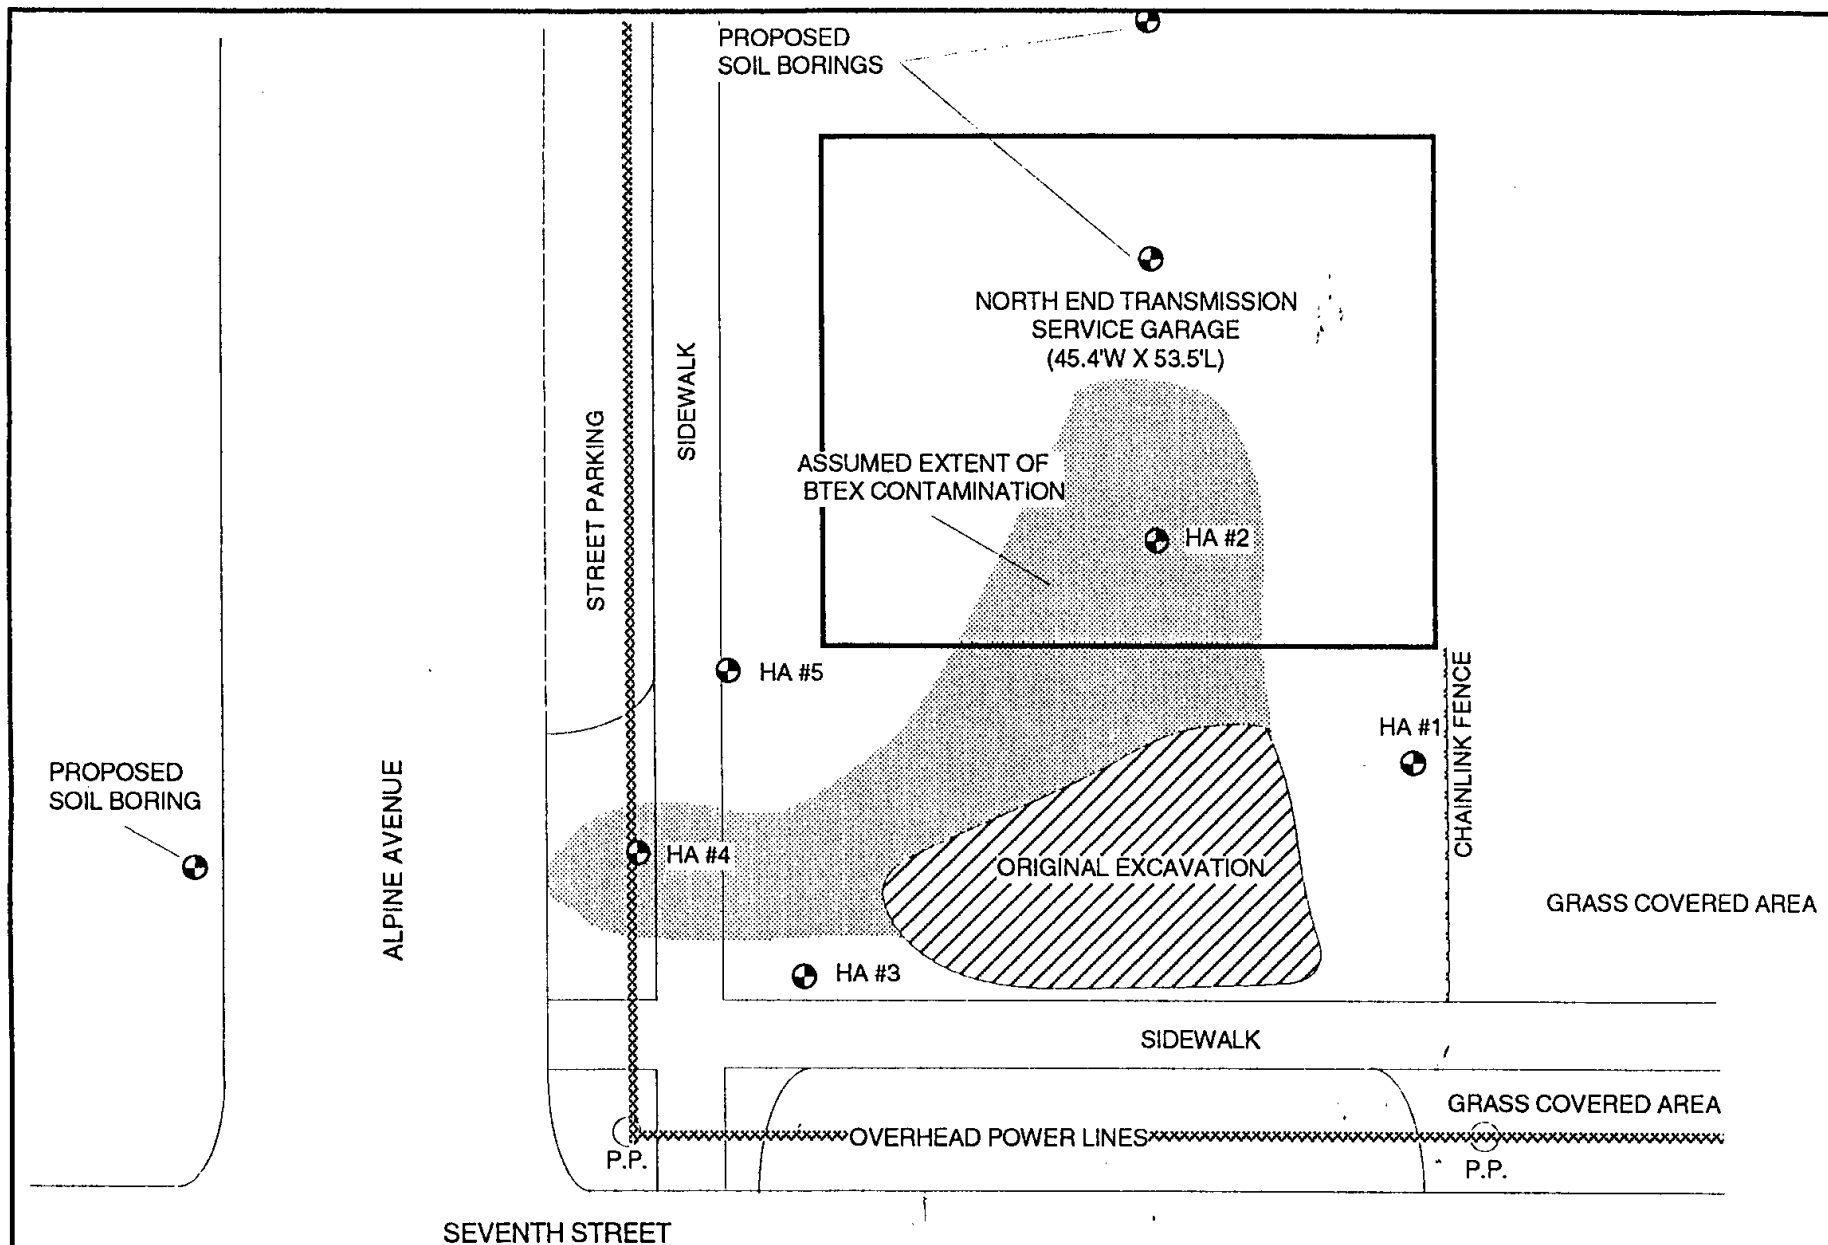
PROPOSED SOIL BORING LOCATIONS
